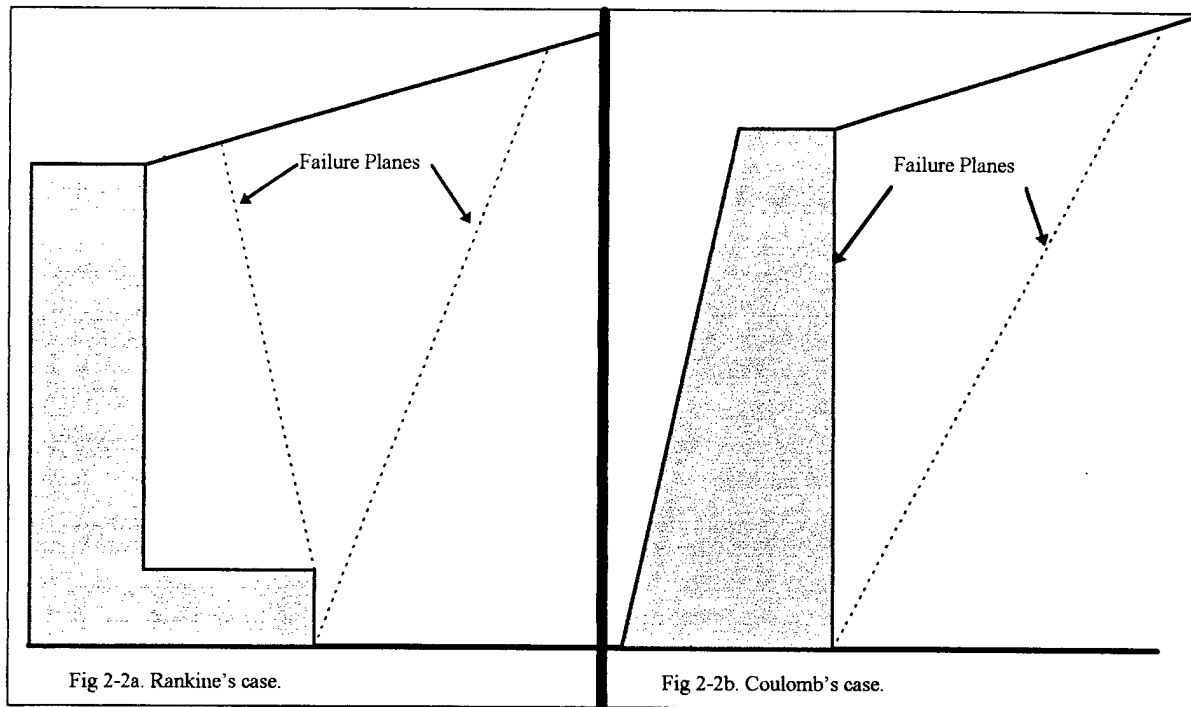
Failure planes for two types of retaining walls.
